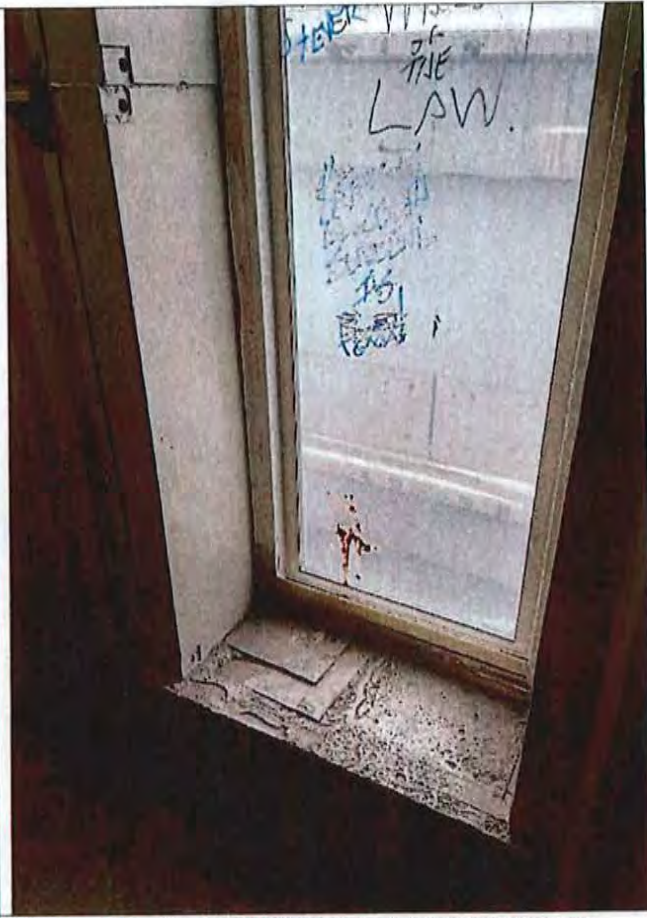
Apparent fecal matter on window of landing between 7th and 8th floors.
